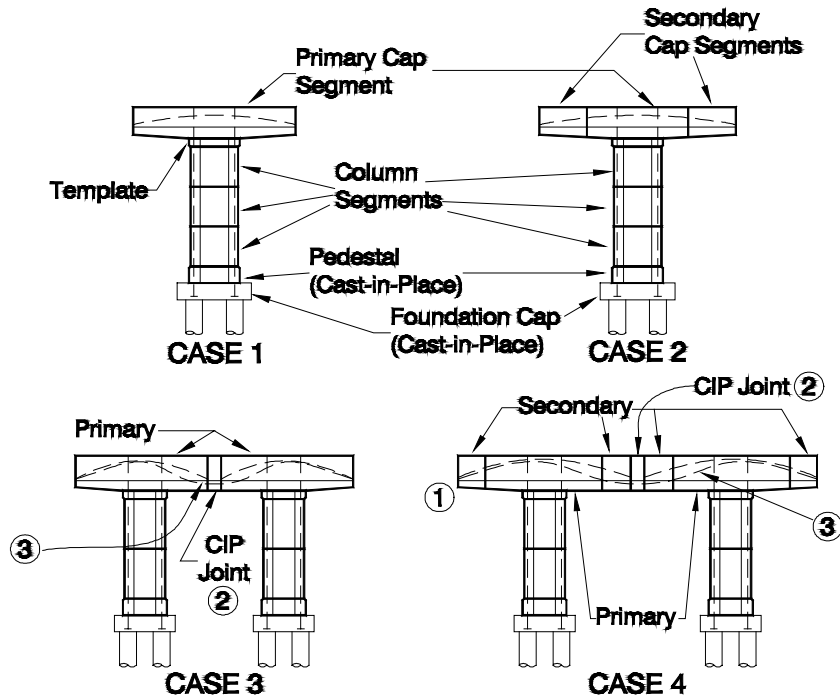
Segmental substructure of Proposal I showing longitudinal cap reinforcement and vertical column reinforcement [7]
